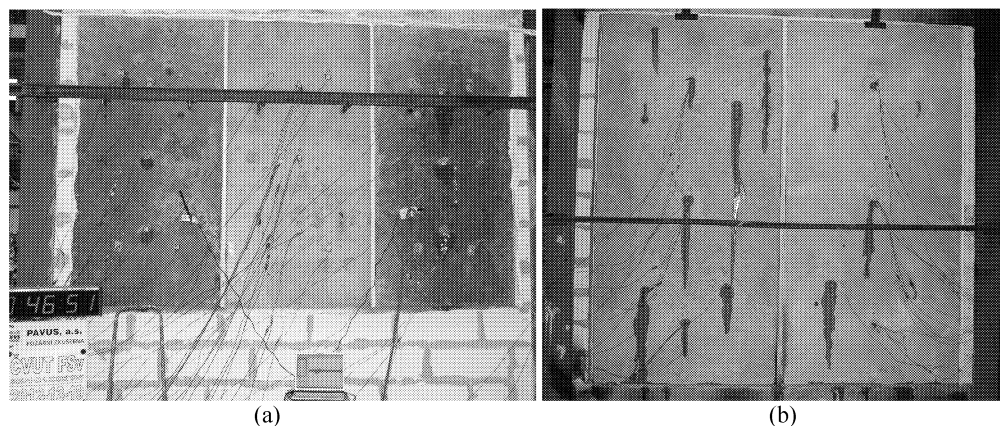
Specimens built-in the fire chamber: (a) three specimens, (b) two larger specimens
